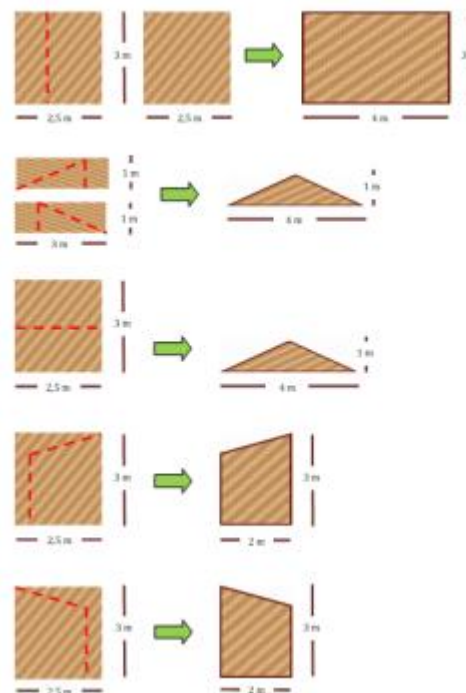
Gedhek Forming Pattern for the Side Wall of a Using House by One Student
